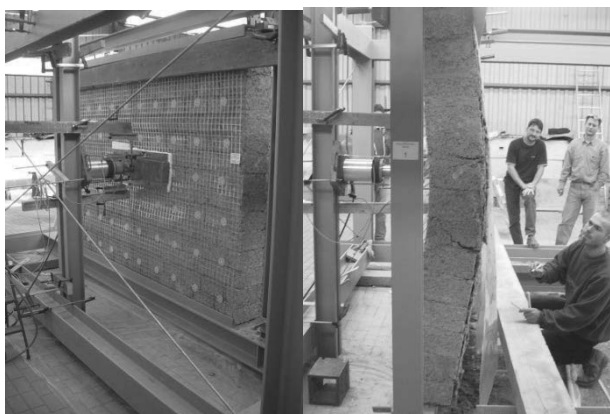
Strength test of geogrid reinforced masonry wall (Burkhardt et al 2005).
